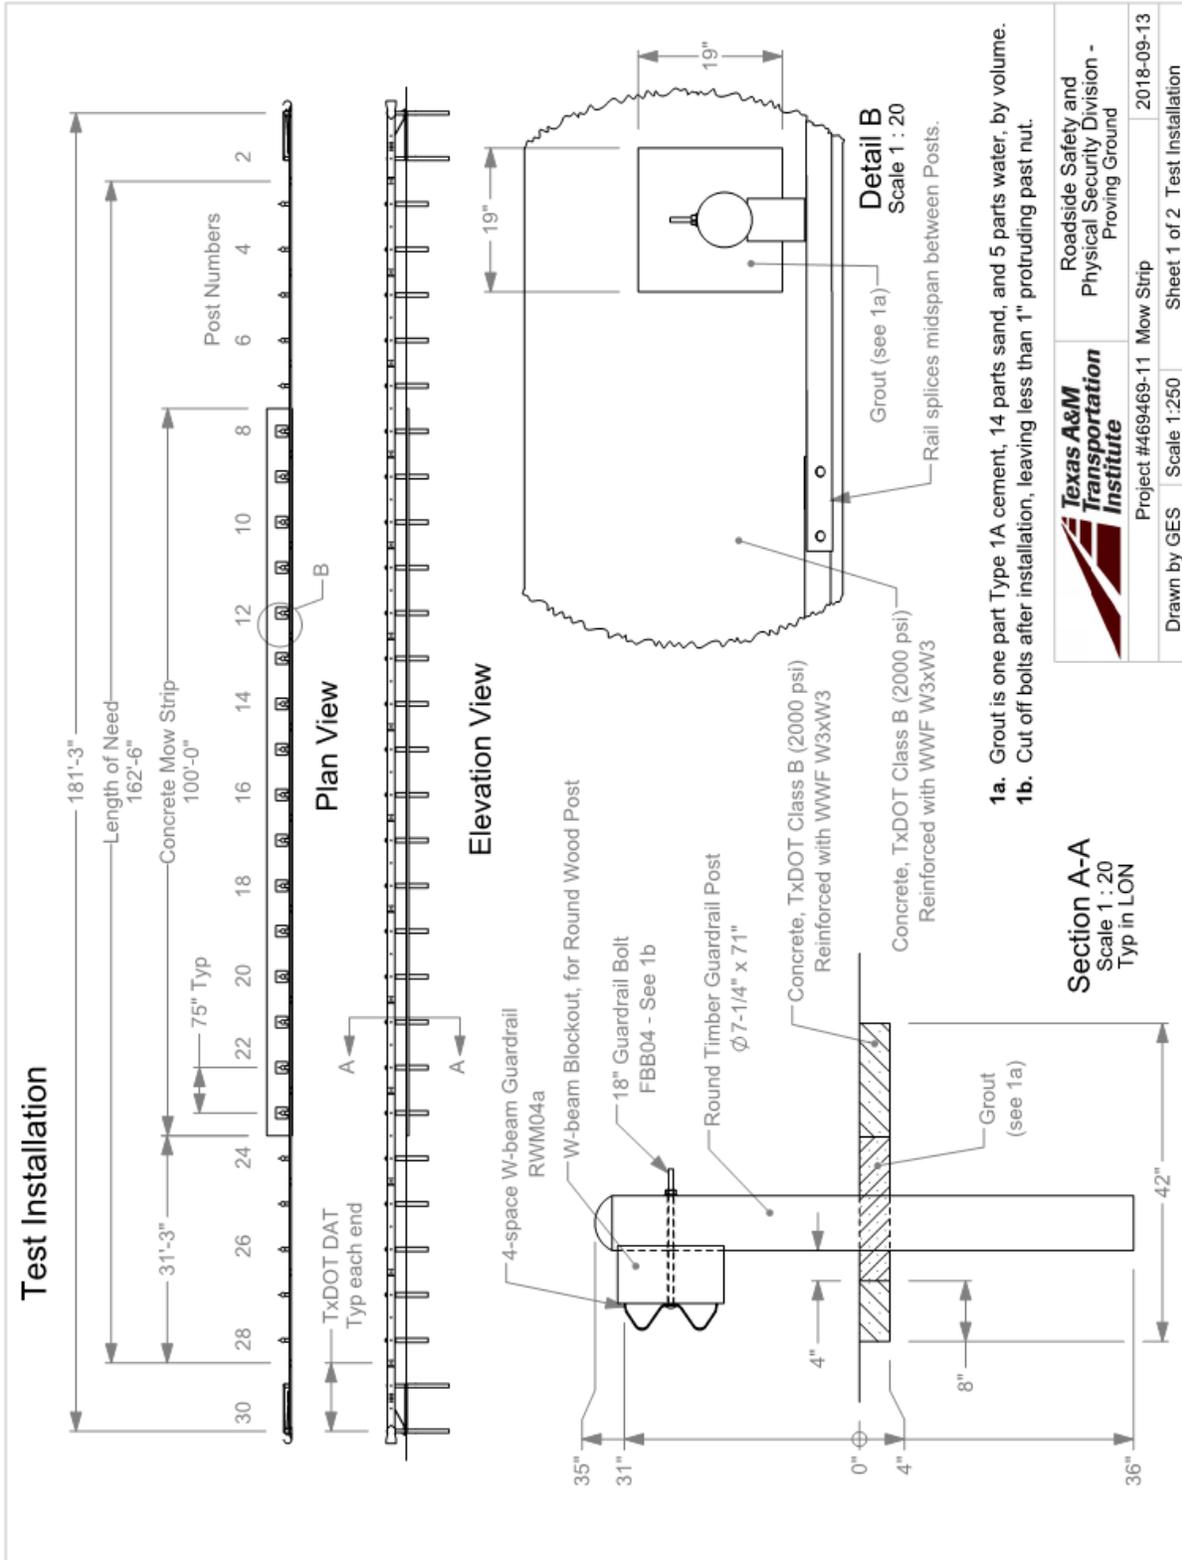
Overall Details of the Round Wood Post Guardrail in Concrete Mow Strip.
